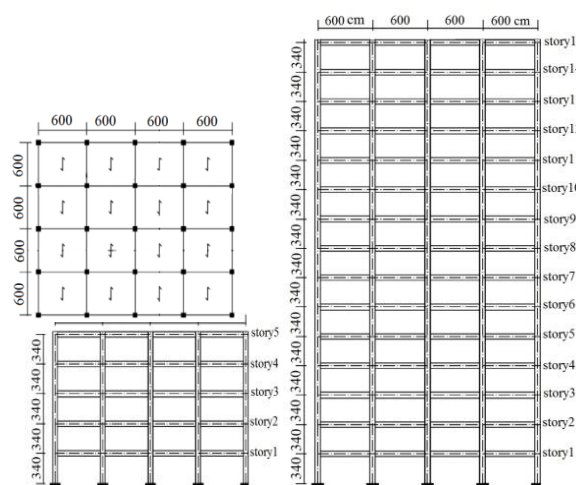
Plan and elevation view of 5 and 15 story frame.
